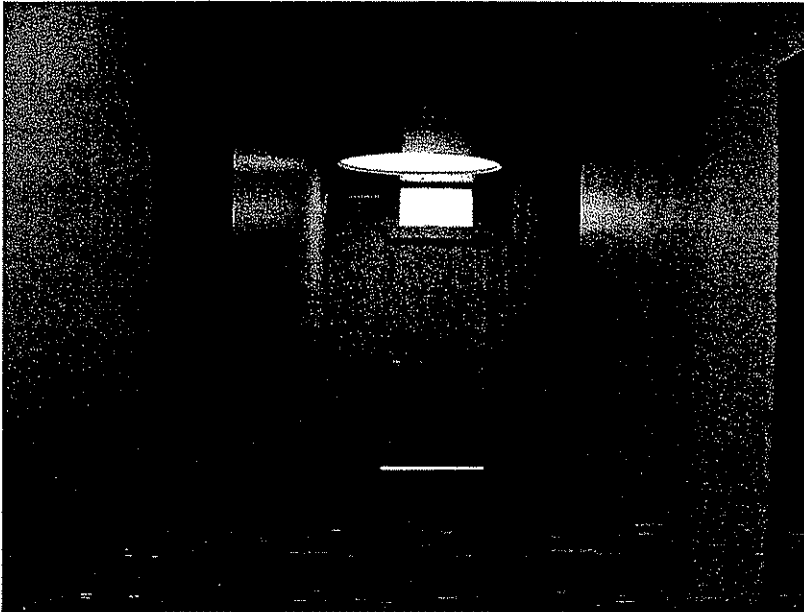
Corridor leading to fire escape showing new fire rated wall at end of corridor accessing fire escape. Note additional section of shear wall (right) required for seismic stiffening.
